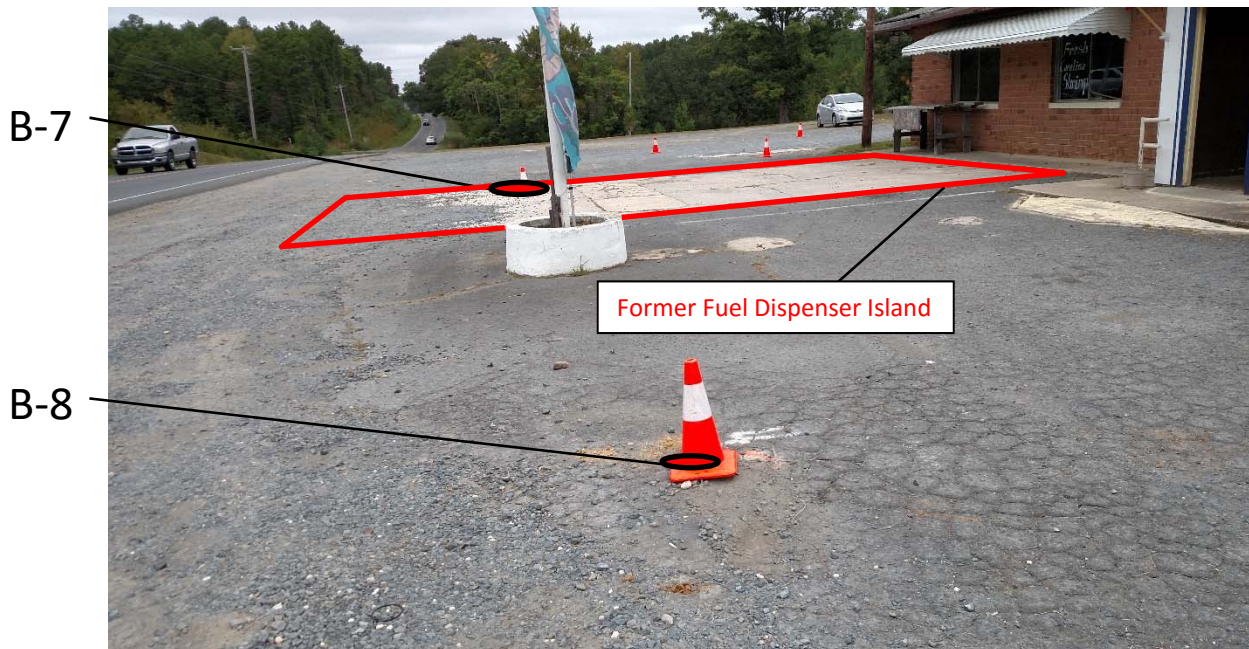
Boring locations B-7, B-8, and a former fuel dispenser island, facing northwest.
